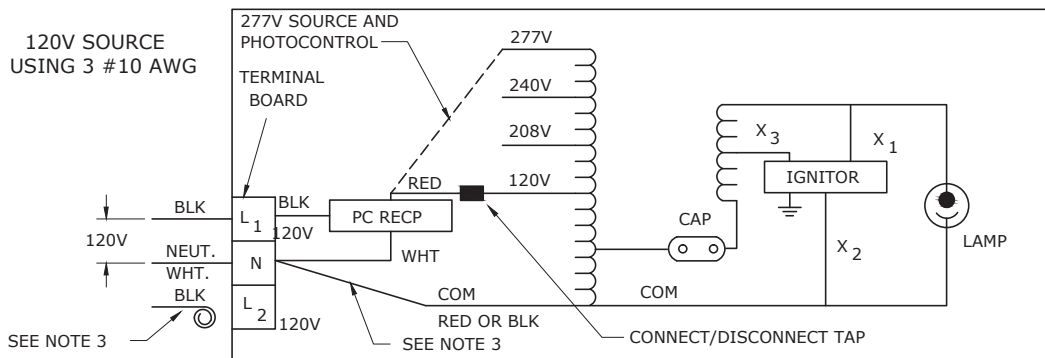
FIGURE B. TYPICAL WIRING DIAGRAM-HPS OR MH CWA LUMINAIRE 208V BALLAST CONNECTION
